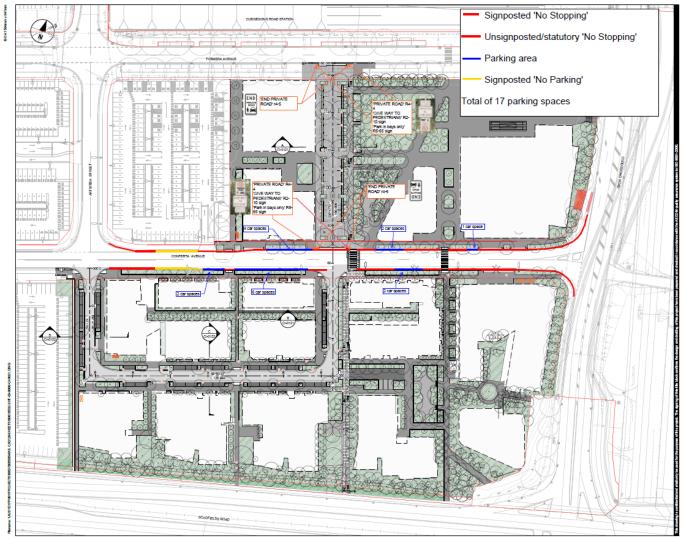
Extract from Civil Plans showing the proposed on-street parking in Conferta Avenue
